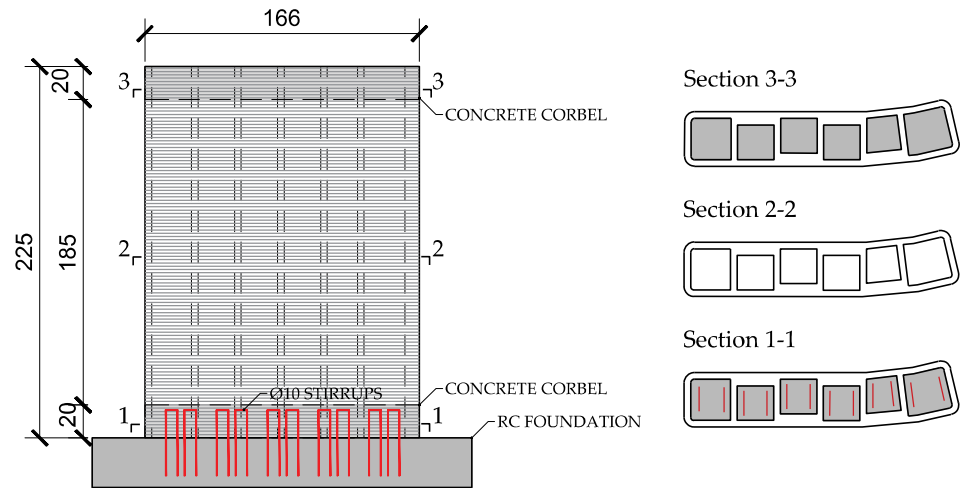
Side view and cross-section view of the 3D printed concrete walls (wall 3).
